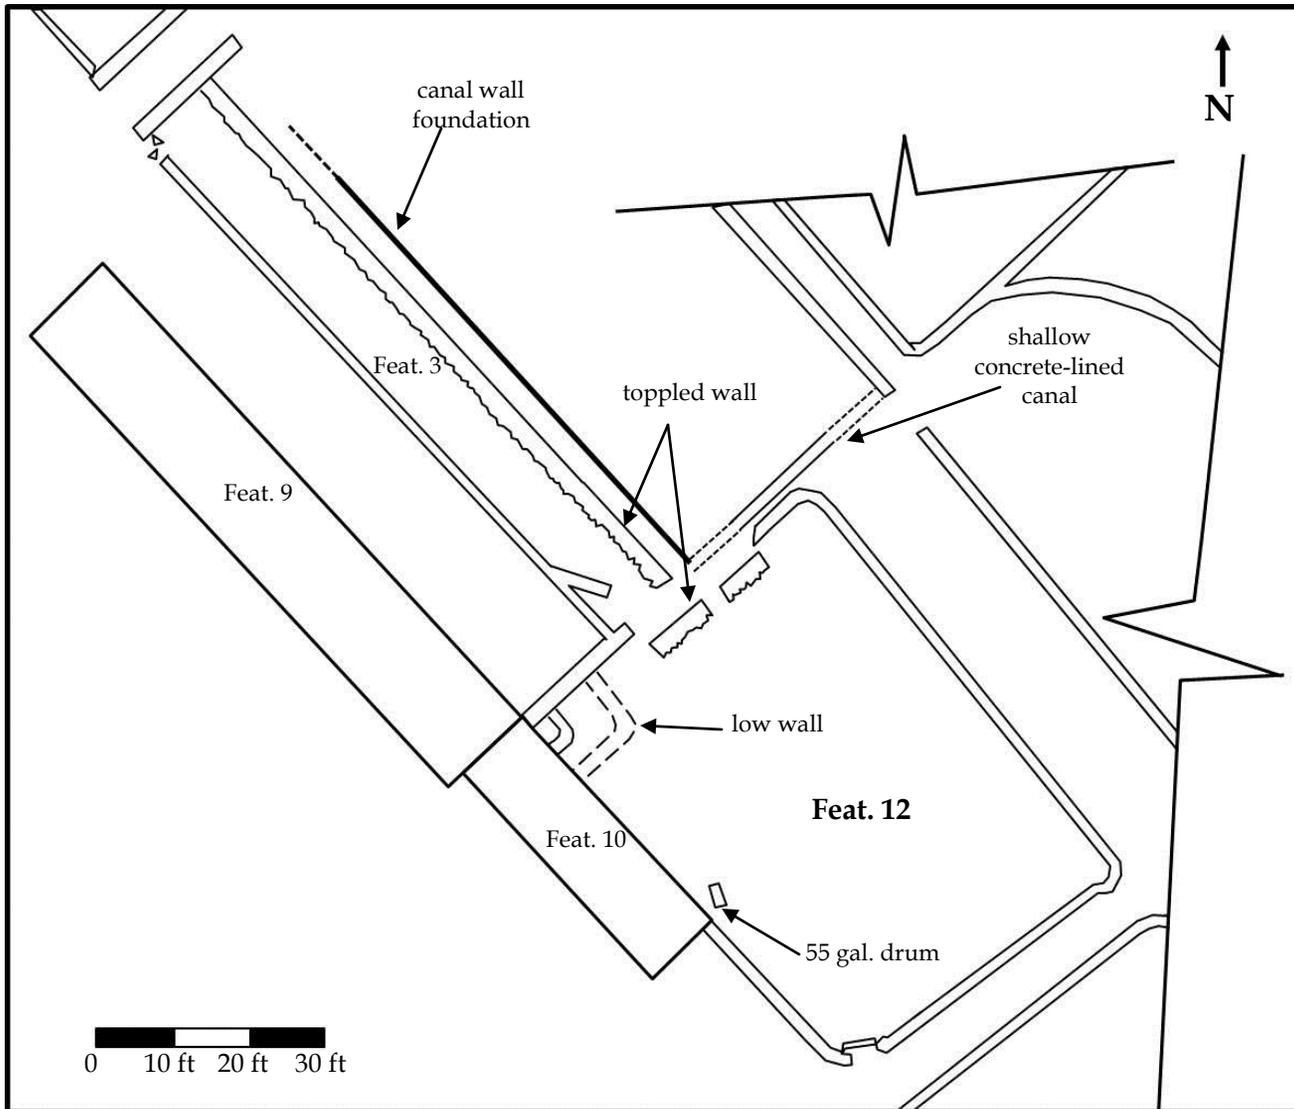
Plan view of Features 9 (fish hatchery garage), 10 (fish hatchery building), and 12 (fish hatchery building pond).
